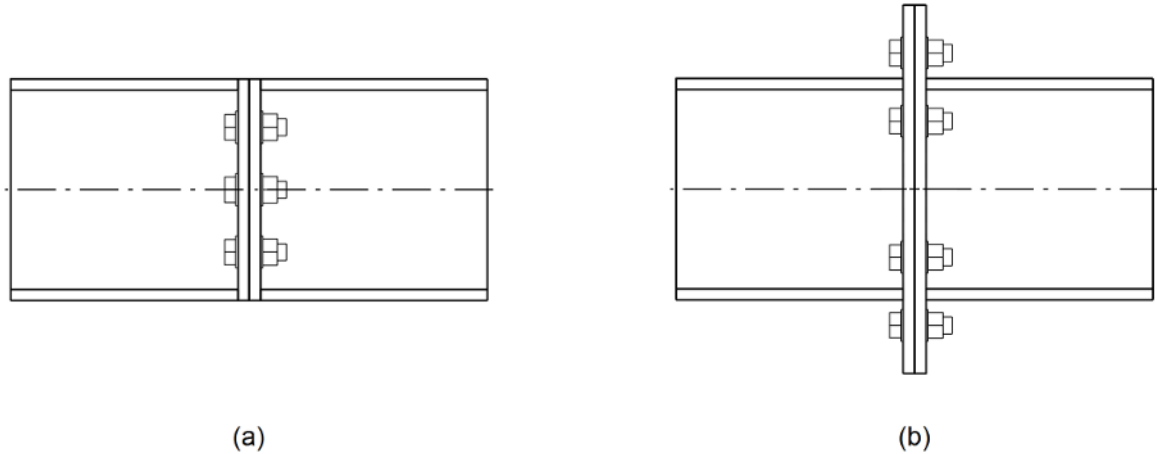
Flush end-plate splice in (a) and extended end-plate splice in (b) for beams and columns.
